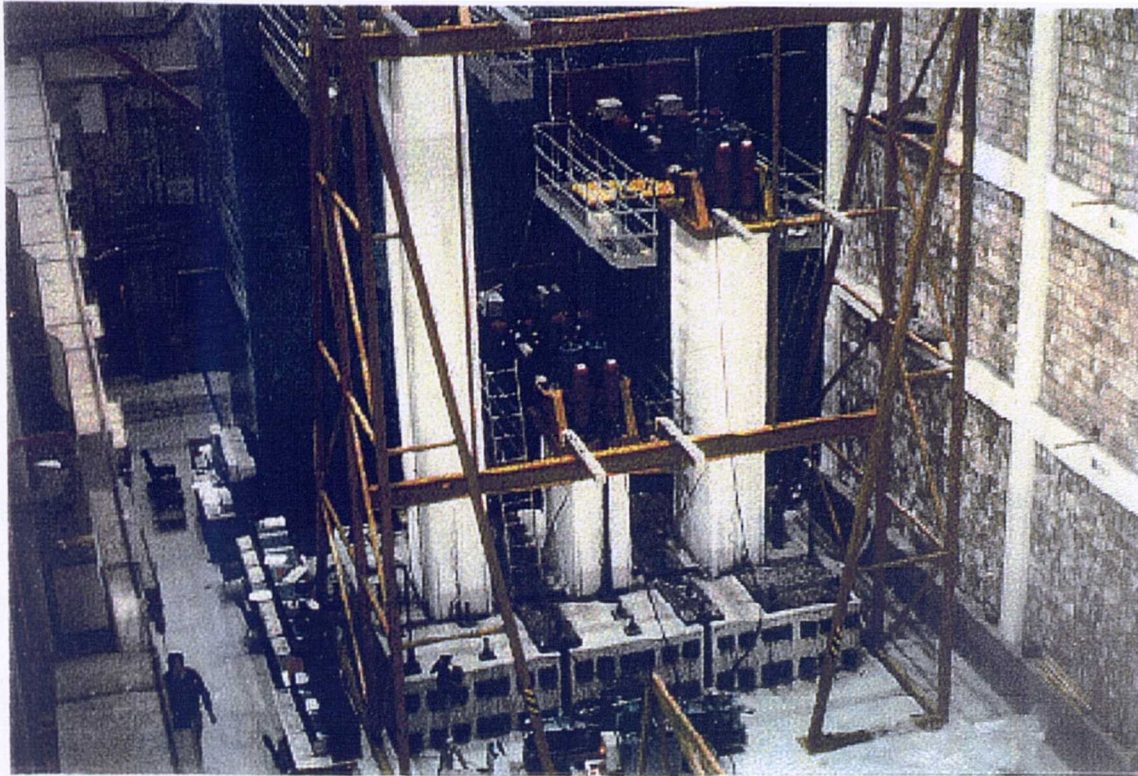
The ELSA reaction wall performing a PSD test of three bridge piers
